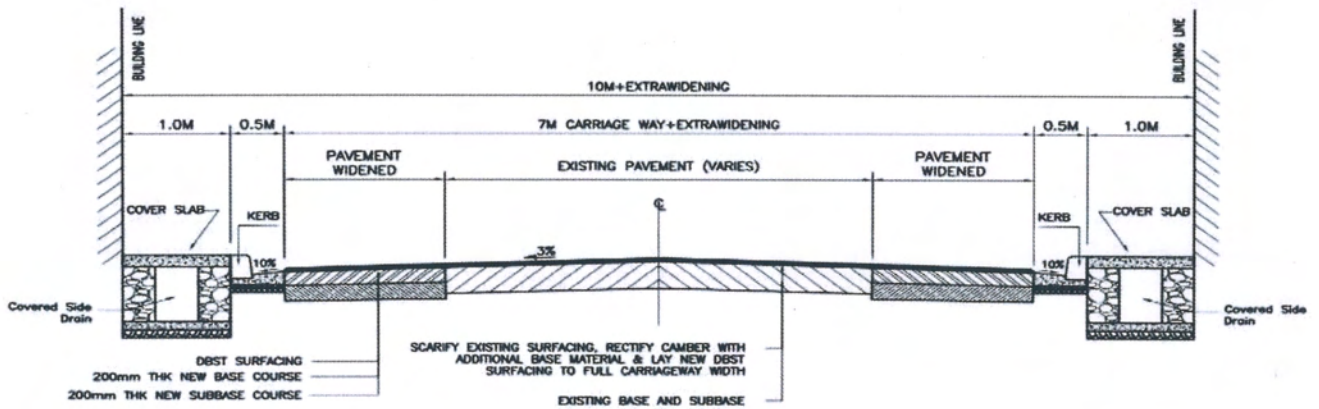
ROAD CROSS SECTION AT BAJAR AREA
